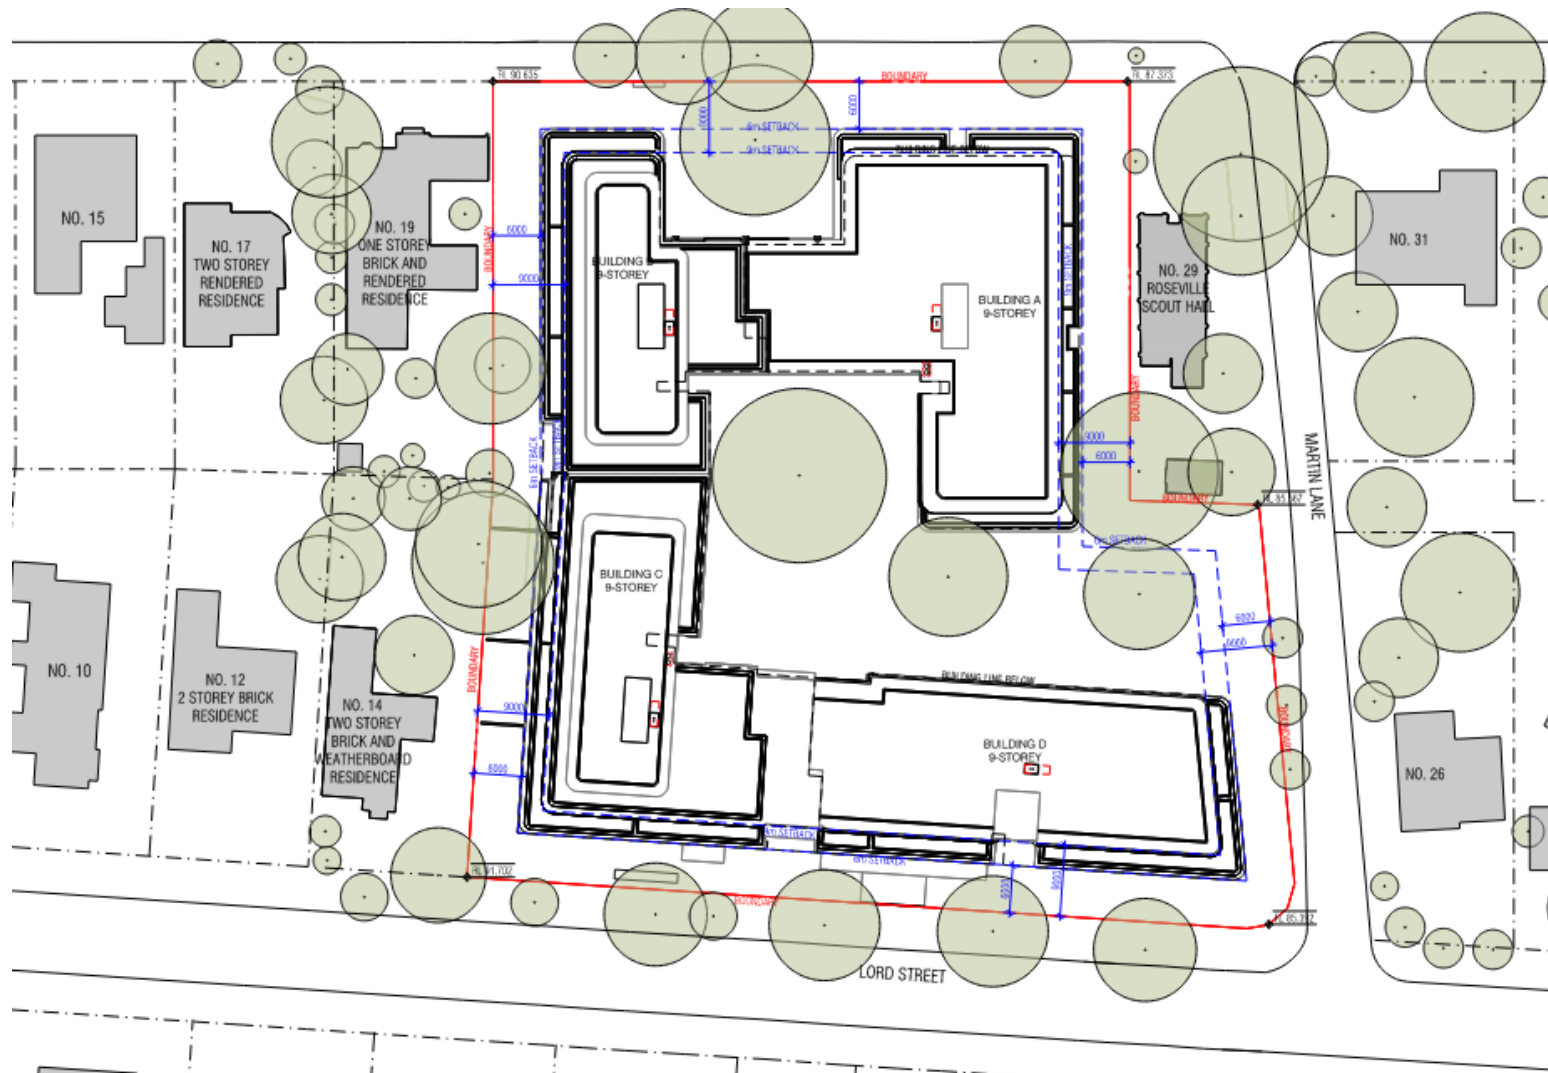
Site plan (source: Fender Katsalidis/Hyecorp)
